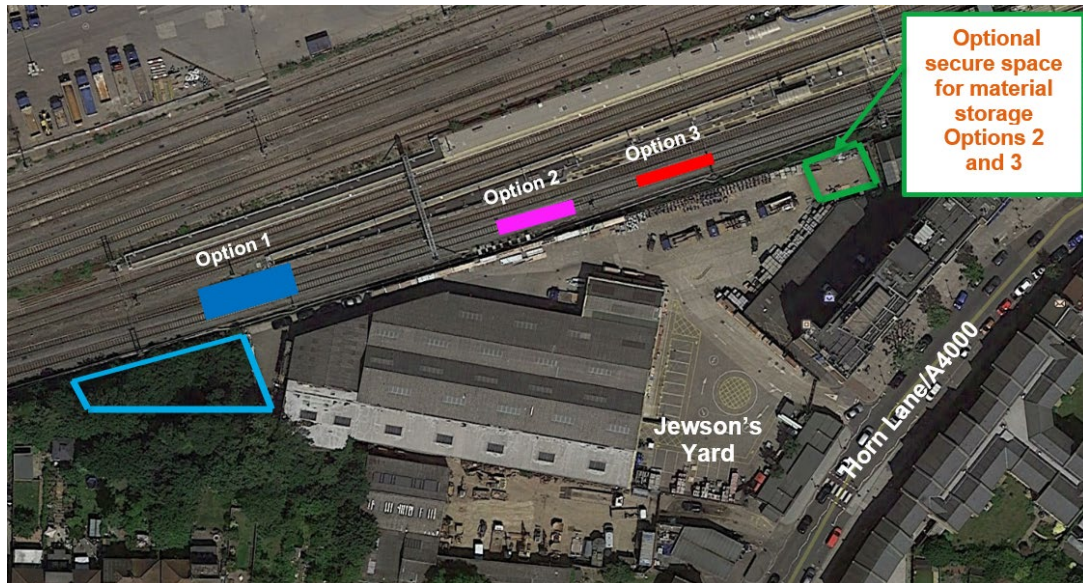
Site Plan showing the 3 proposed options for Jewson's Yard
